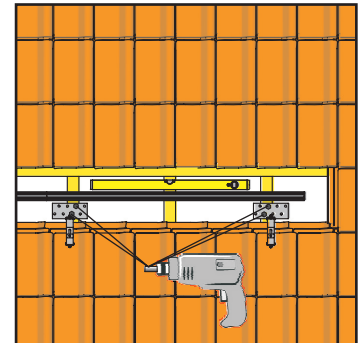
Attach the roof brackets to the rafters with at least two screws
